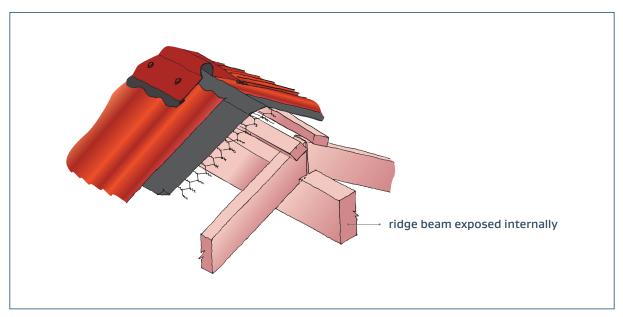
Rafters sitting on ridge beam showing the plumb cut
